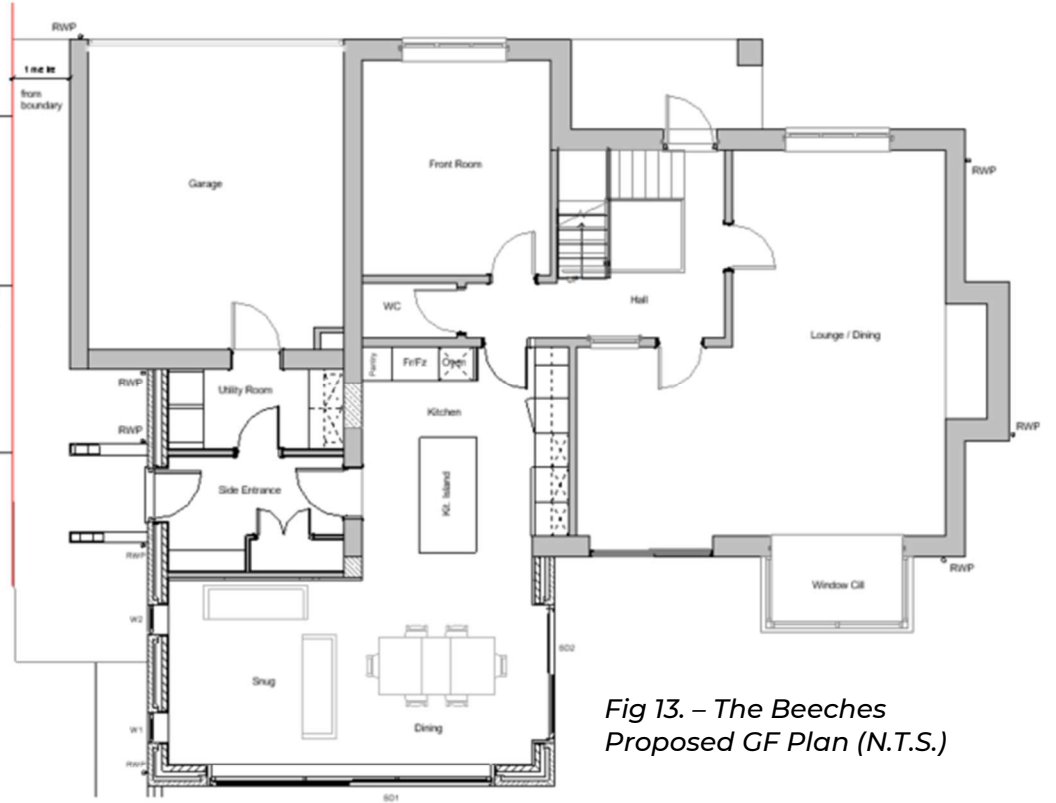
The Beeches Proposed GF Plan (N.T.S.)
